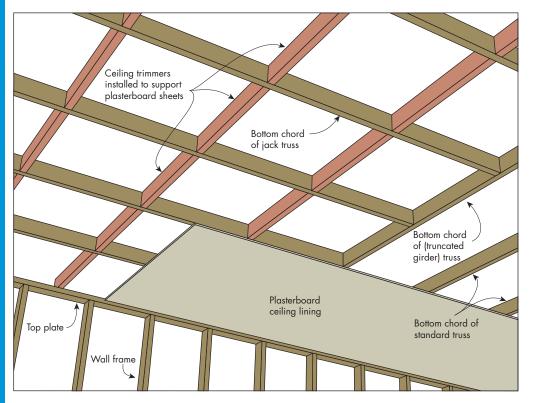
Install Ceiling Trimmers to Support Plasterboard at The Change of Direction of Roof Framing. Install Plasterboard Perpendicular To Main Roof Frame
